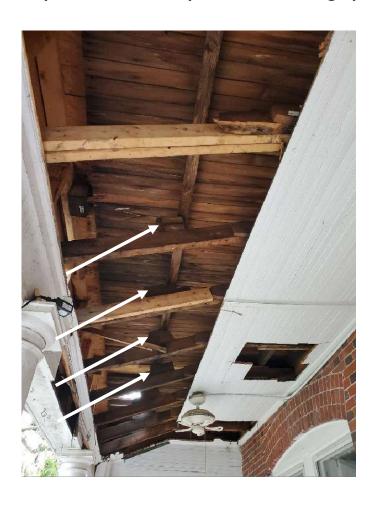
7102 Maple Ave – 'wall' above support beam
